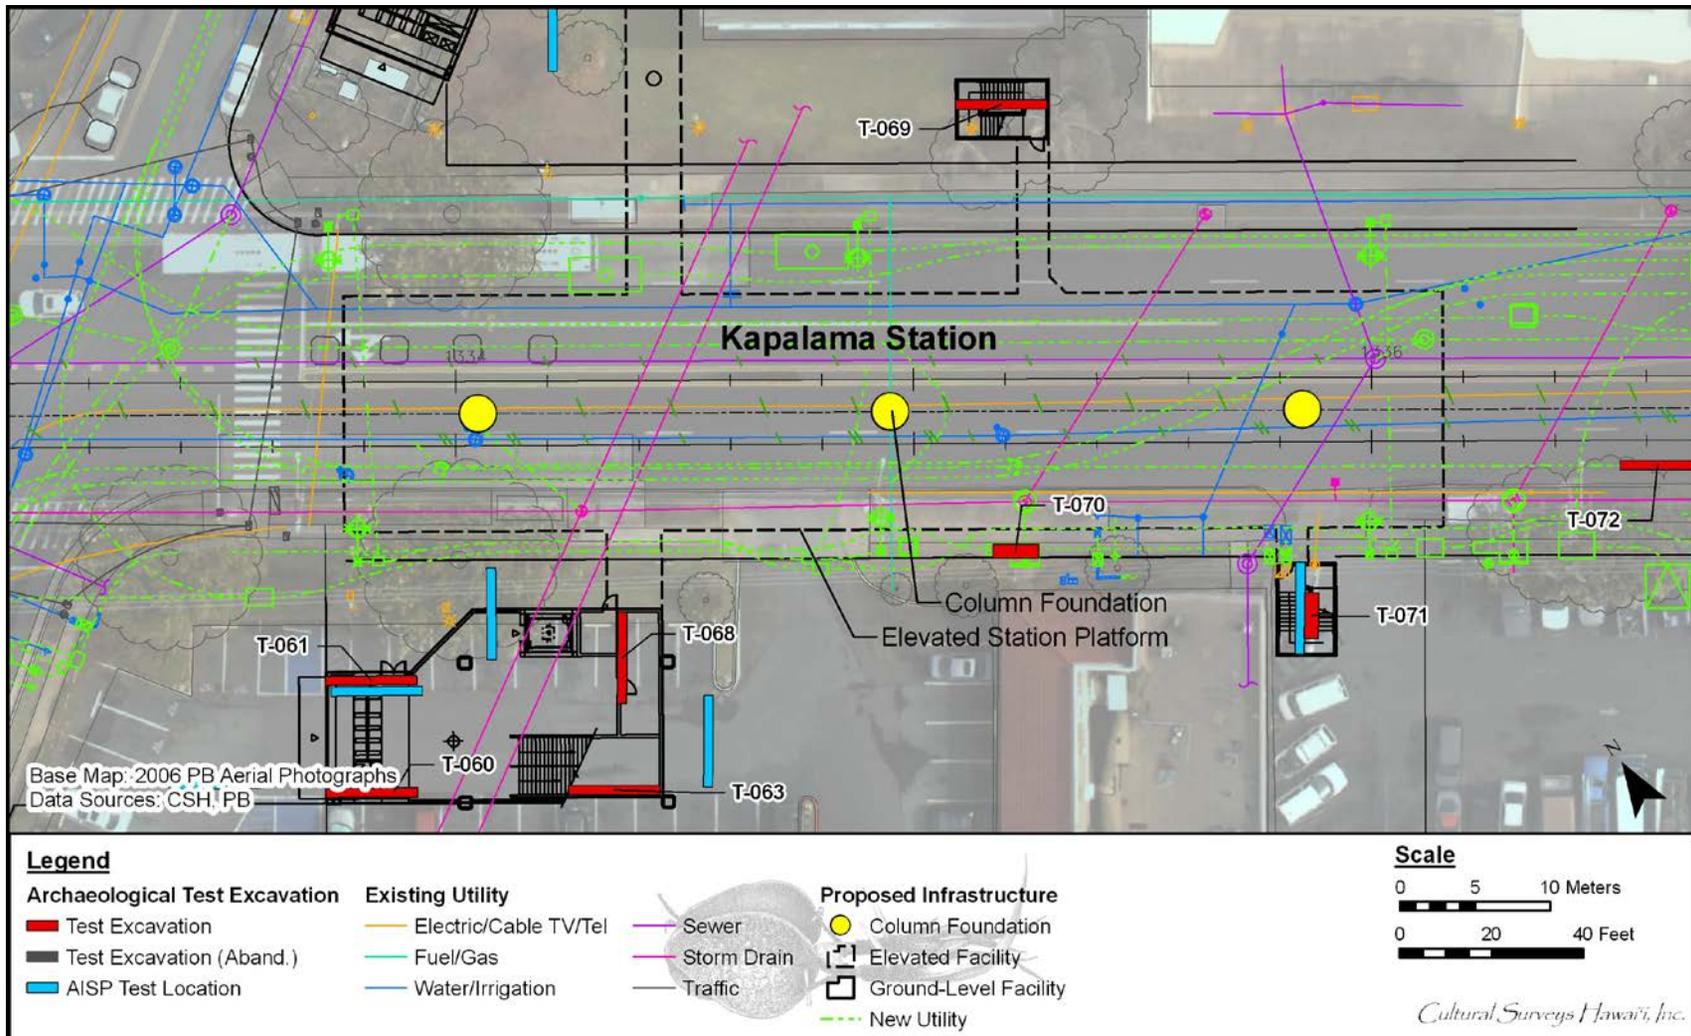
Kapālāma Station, detail of column foundation layout at Dillingham Boulevard showing locations of proposed AISP and actual AIS test excavations; note that no testing of the three station column foundations was conducted due to utilities
